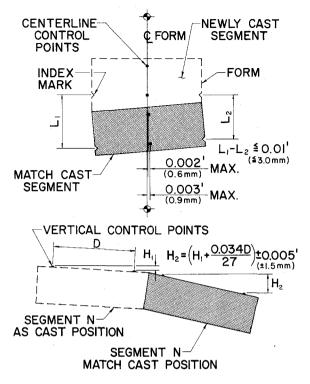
Segment positioning for match-casting and match-casting tolerances.
